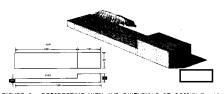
PERSPECTIVE VIEW AND DIMENSIONS OF POSSIBLE LABORATORY/QUALITY TEST BUILDING (item 1, Figure 3).
